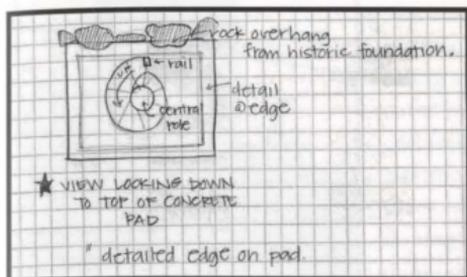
Sketch showing the raked edge detail of the concrete pad on the northern elevation, as well as the overhang of the historic rock foundation.
